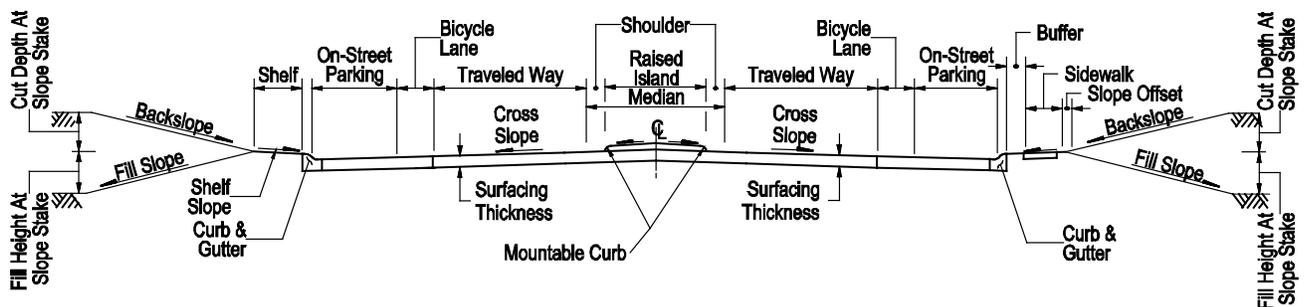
Example Two-Lane Roadway with Bicycle Lanes and On-Street Parking
